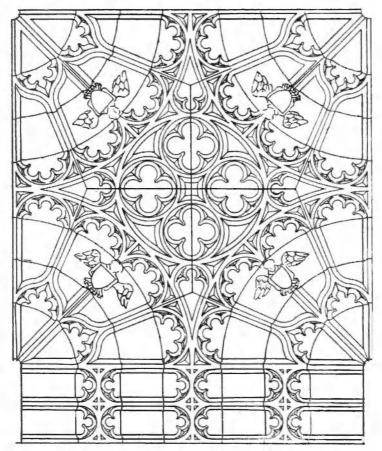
PLAN OF VAULT, SOUTH PORCH, TORBRIAN, DEVON.
